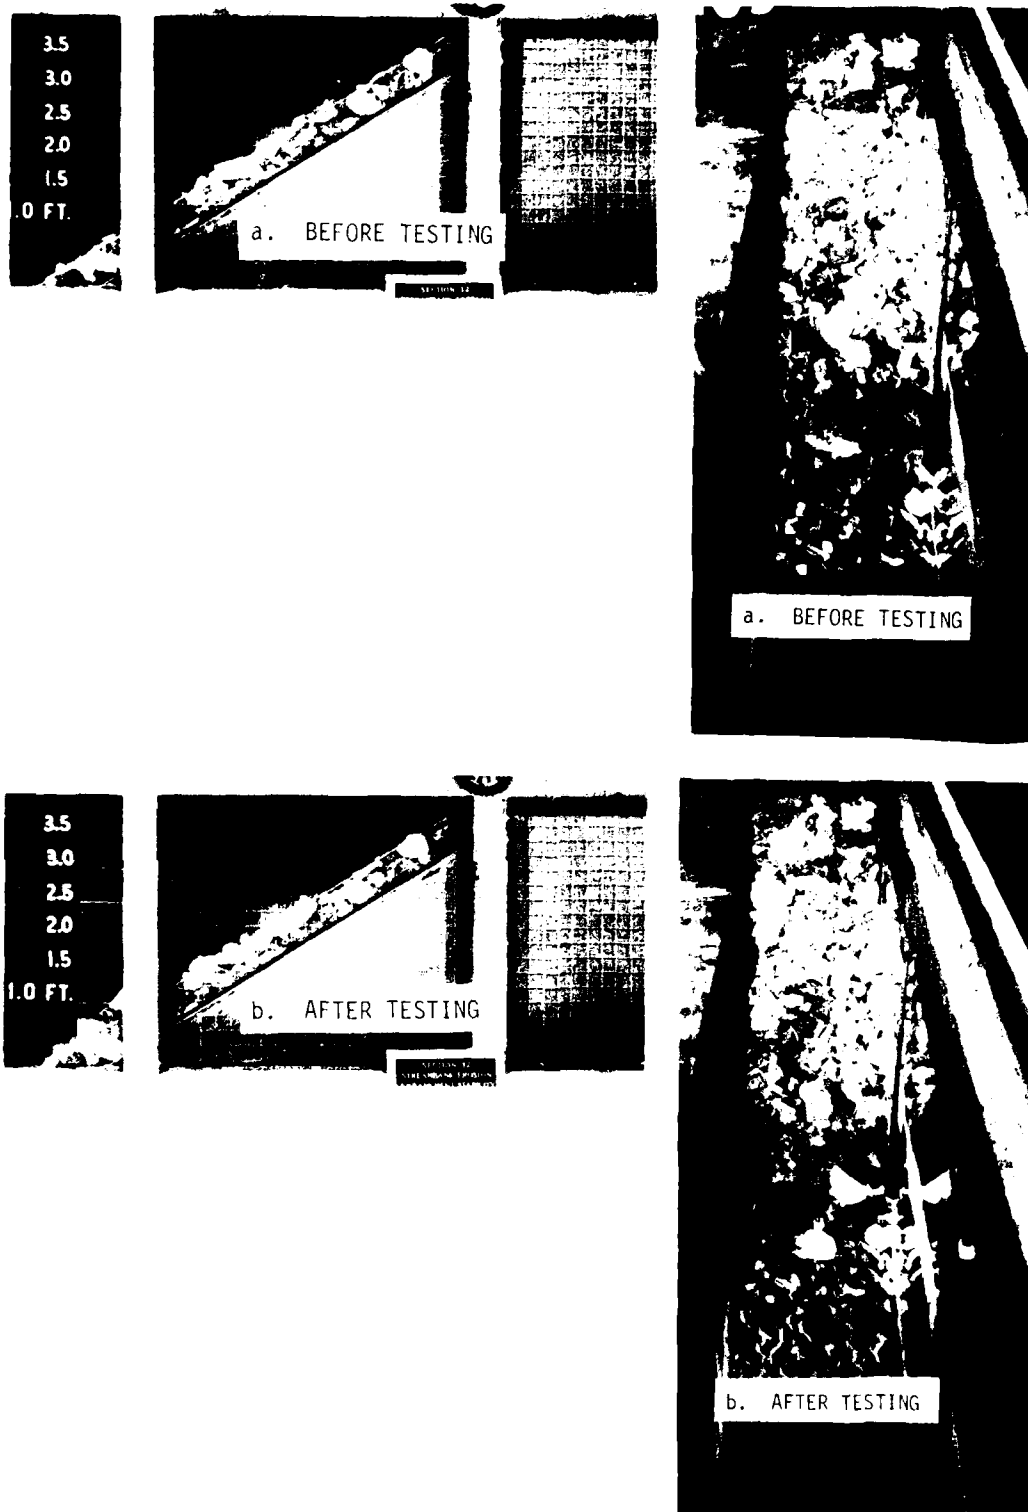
Plan 5A, before and after testing 4.0-sec, 0.70-ft nonbreaking waves
